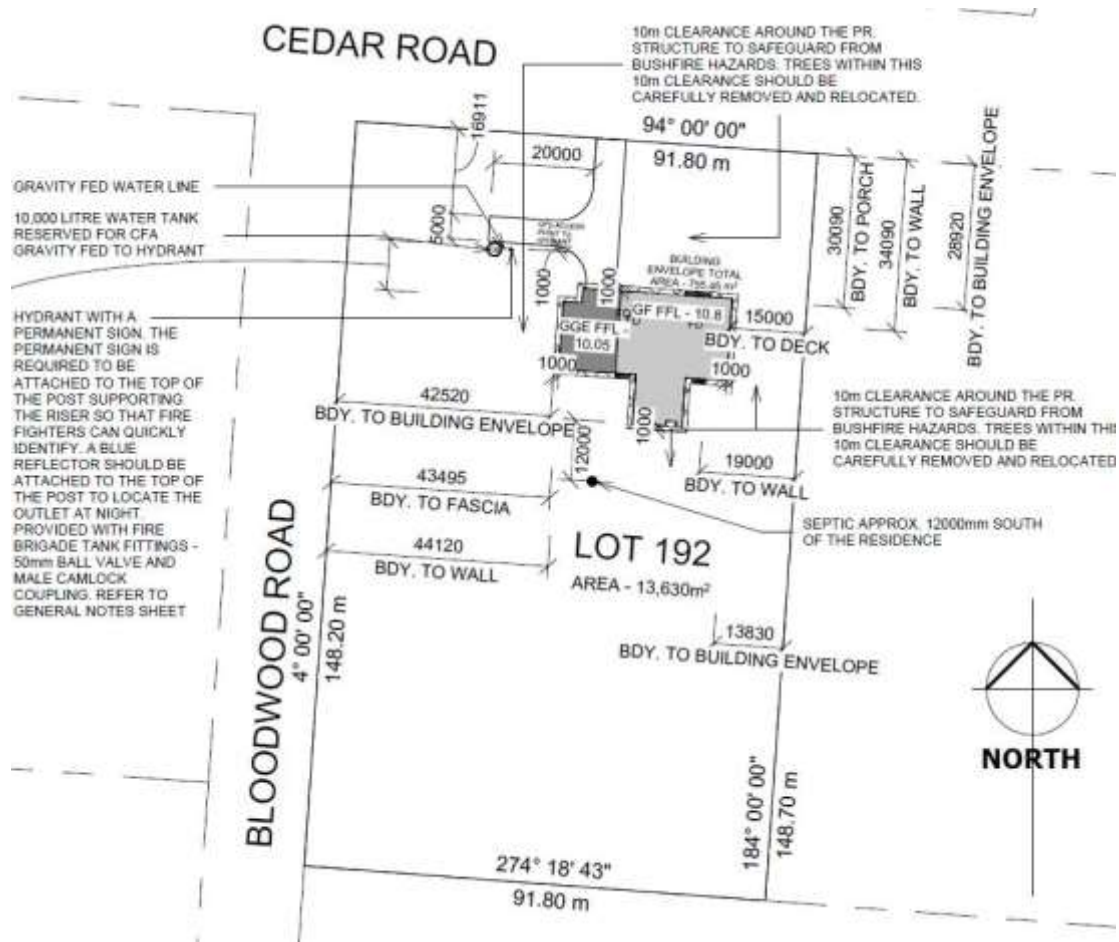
Proposed Dwelling House Plan (Speedy Gomez Design and Draw).
